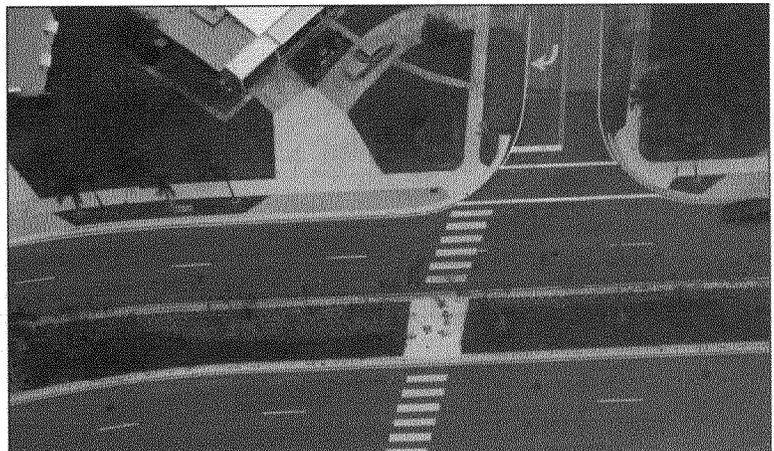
Refuge islands provide pedestrians with a resting place when crossing roads or intersections.
